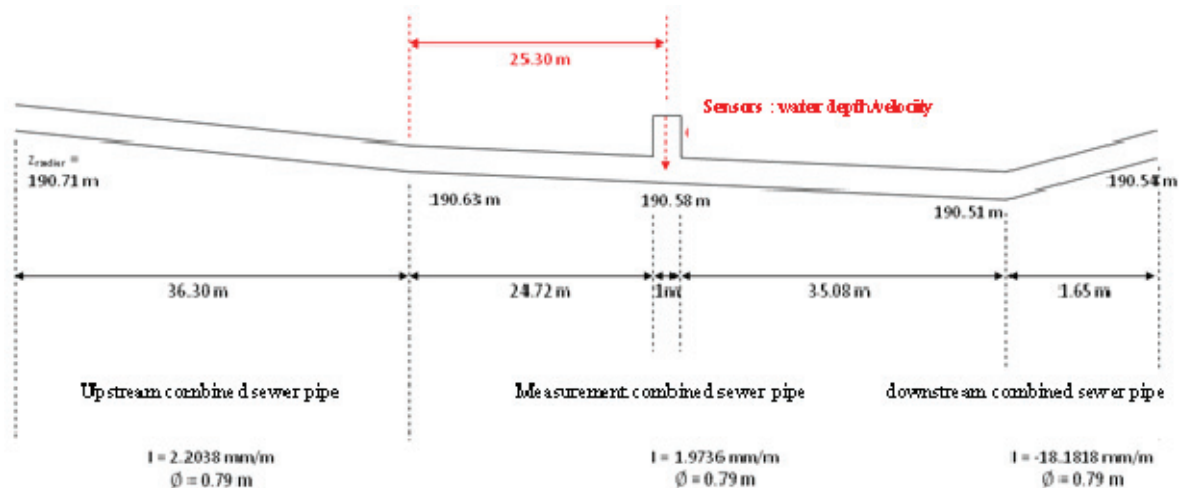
Longitudinal sketch of the combined sewer pipe – the mean upstream and measurement channel slope is around 0.2% and the downstream slope is around -2%
